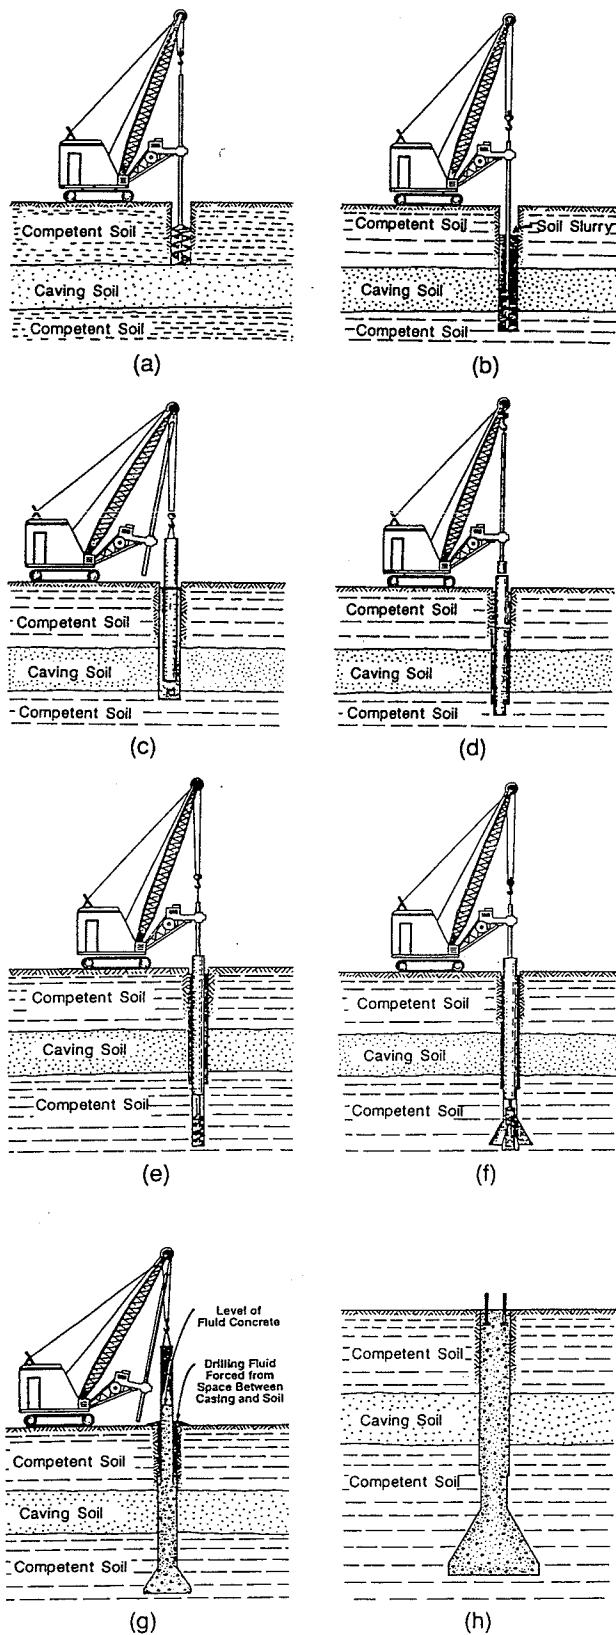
Casing method of construction: (a) initiating drilling, (b) drilling with slurry, (c) introducing casing, (d) casing sealed and slurry being removed from interior of casing, (e) drilling below casing, (f) underreaming, (g) removing casing, and (h) completed shaft. (From Reese and O'Neill, 1988)
